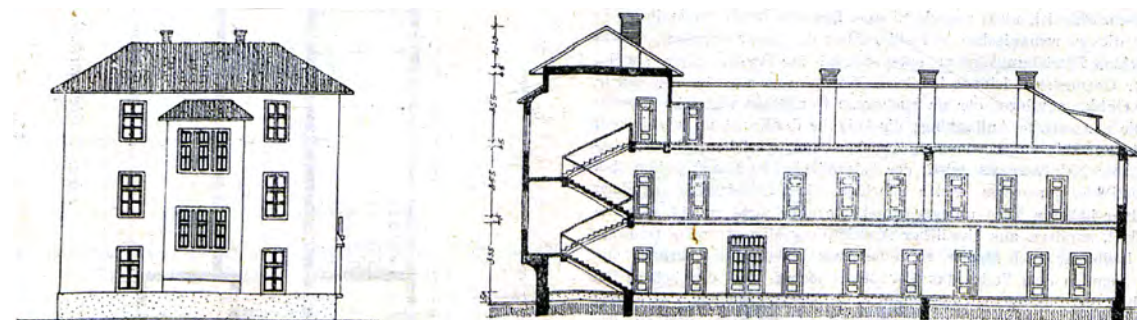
Invalid house; elevation view from west and longitudinal section view.
